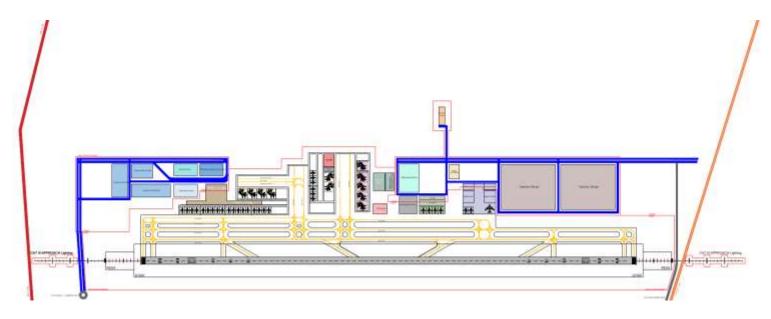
Airport Precinct Layout Plan for 7.2mppa.
